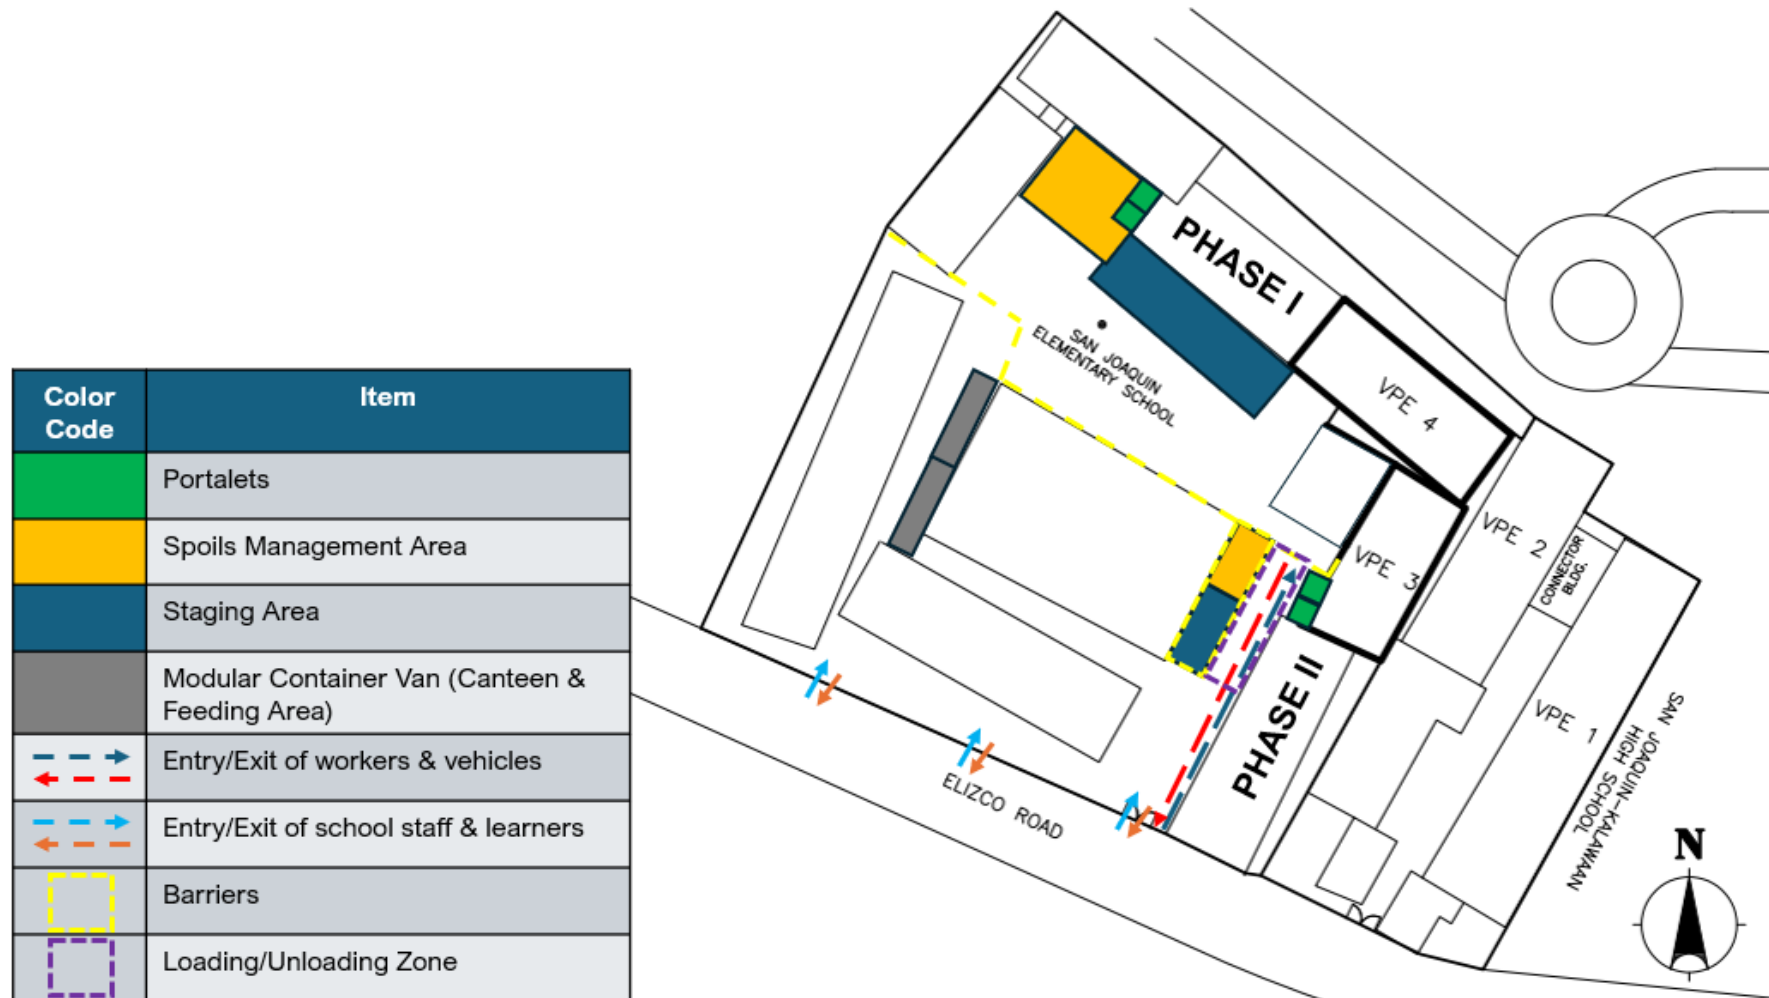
Proposed Staging Area and other Support Facilities in San Joaquin-Kalawaan High School
